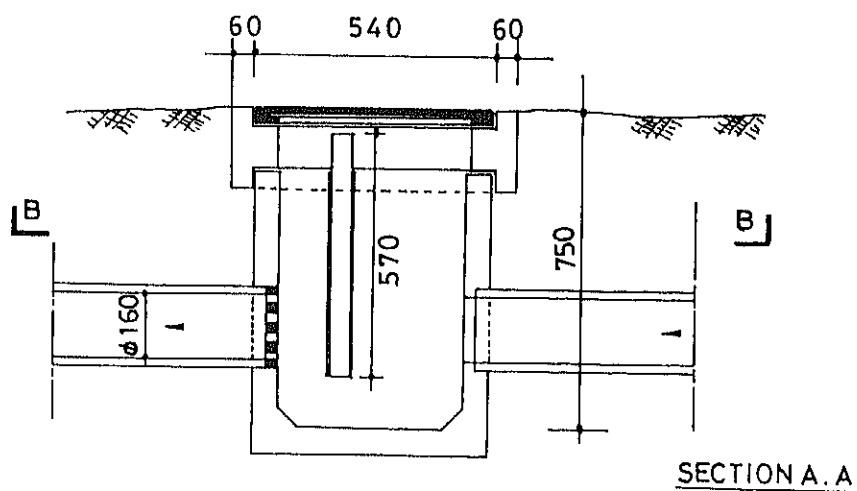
TYPICAL HOUSE CONNECTION (CROSS SECTION)
